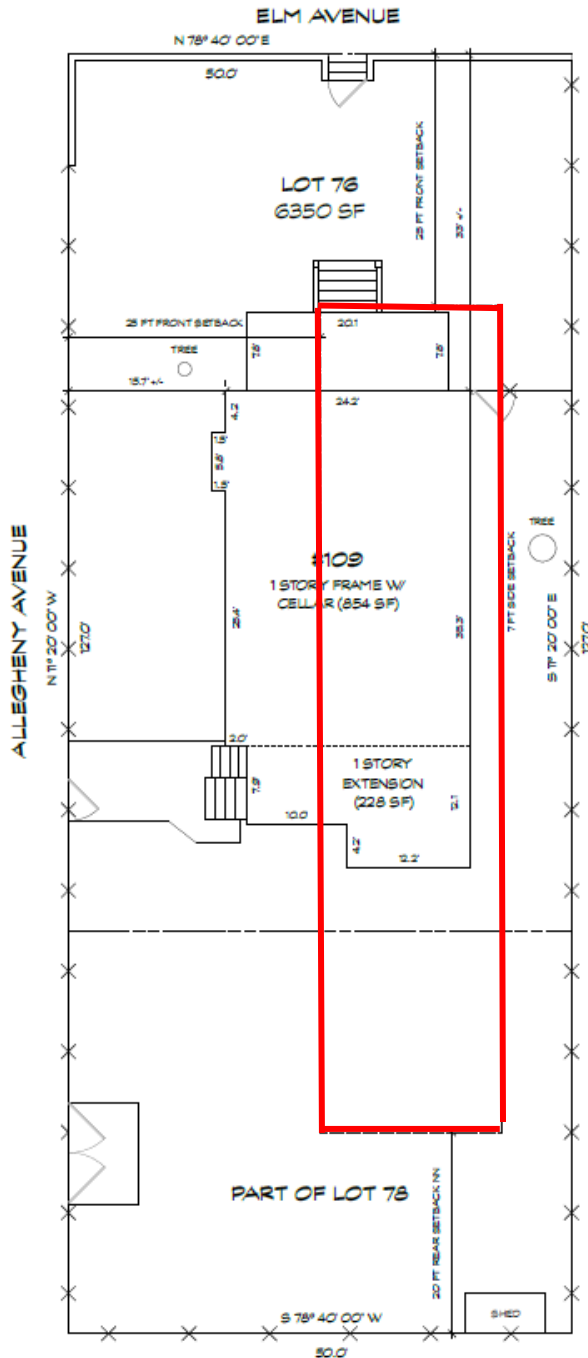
Existing site plan, with the buildable envelope outlined in red.
